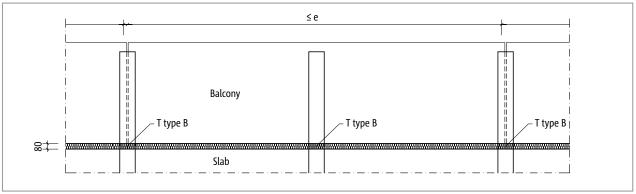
Schöck Isokorb® T type B: Expansion joint layout
